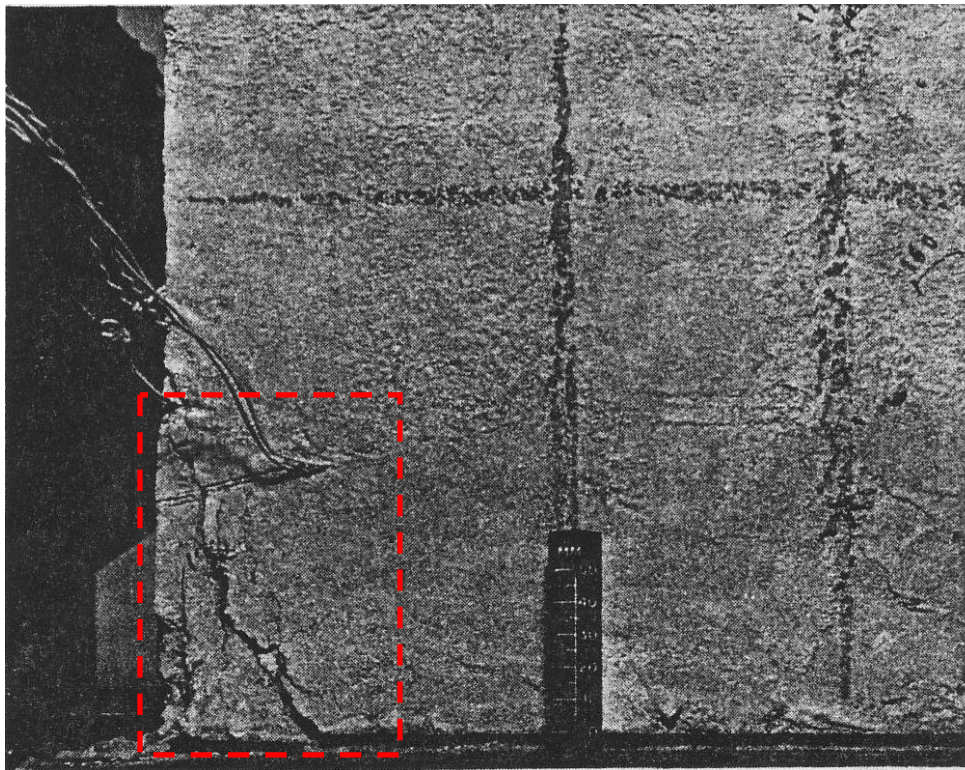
Typical condition of Lefas Type II walls at the end of a test [Lefas et al. (1990)]
